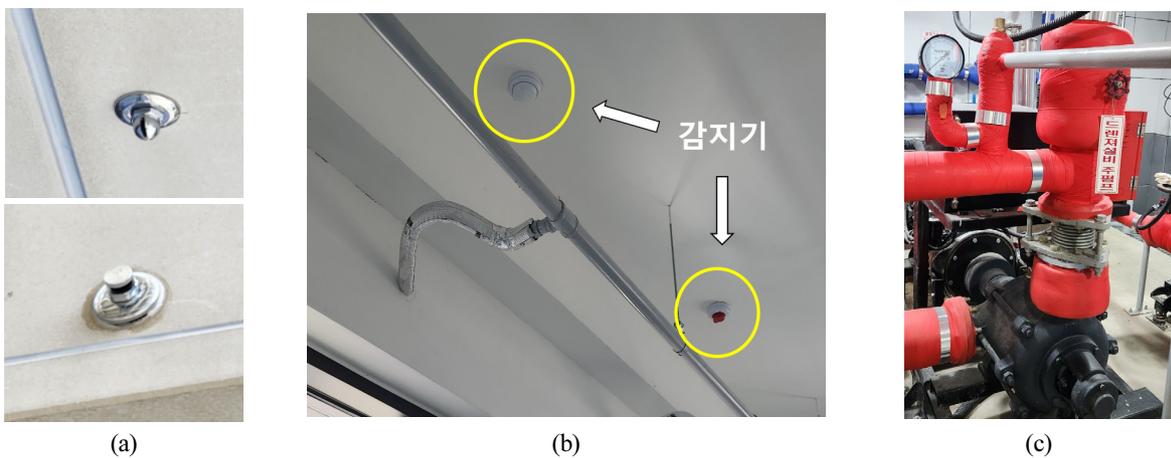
(a) Picture image of drencher head (b) Smoke detector (c) Fire pump
